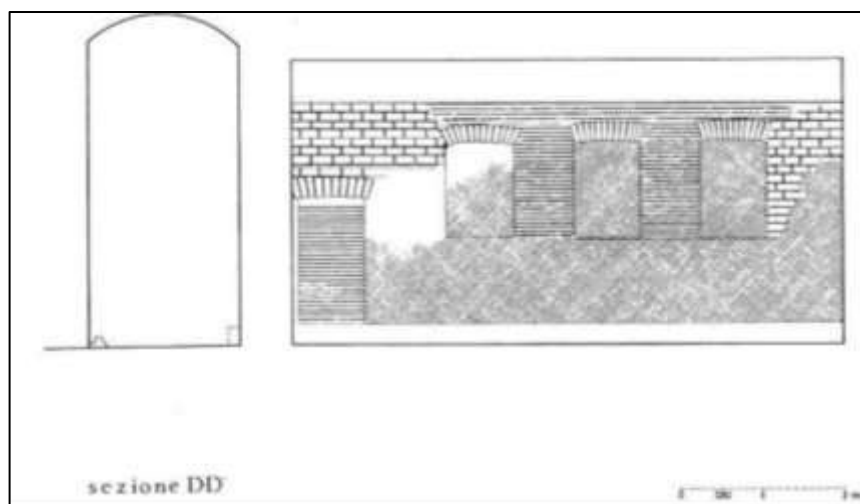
Section of the wall between Room A and E after the structural modifications (from Boldrighini 2003: fig. 20).
